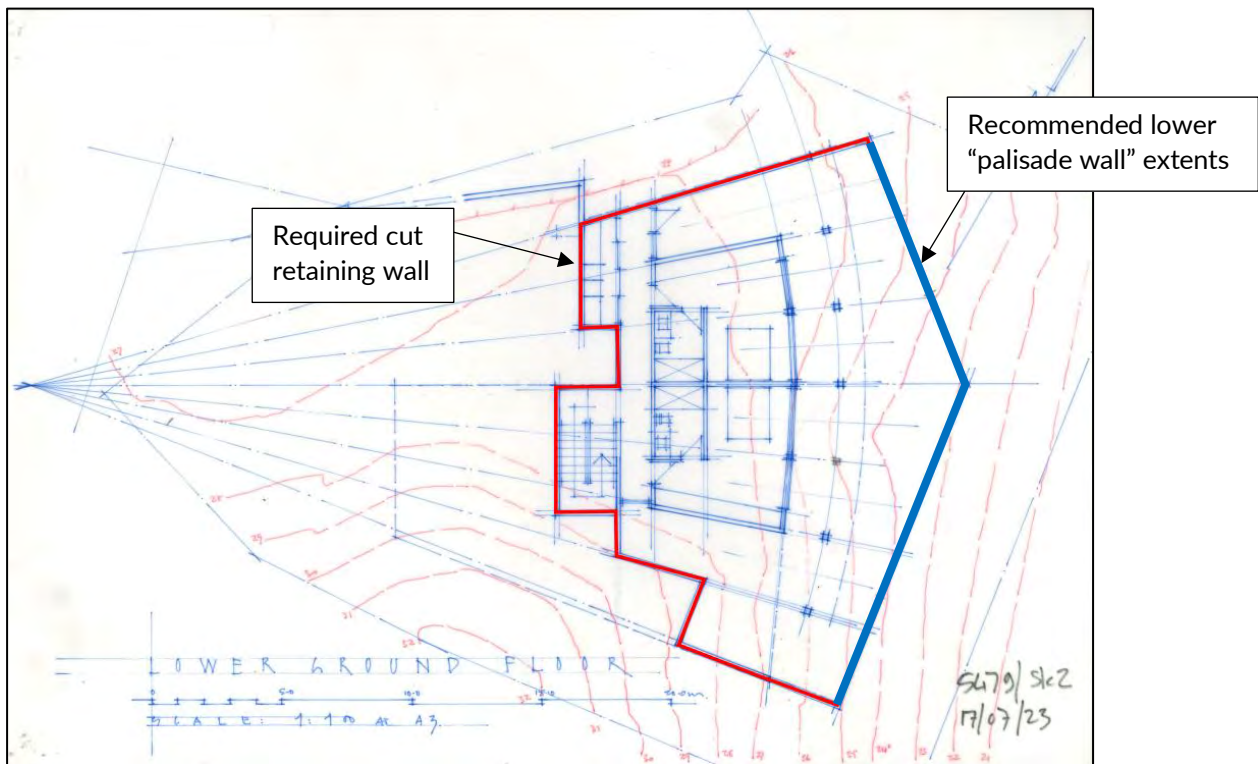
Retaining wall Location Plan for the Lower Floor (24 mRL)
